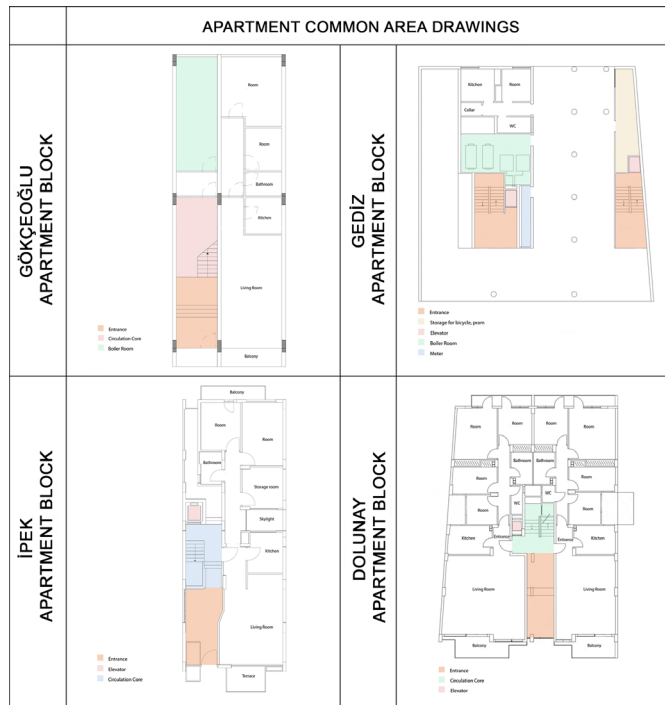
Apartment common area drawings of case study apartment buildings. Prepared by the authors.
